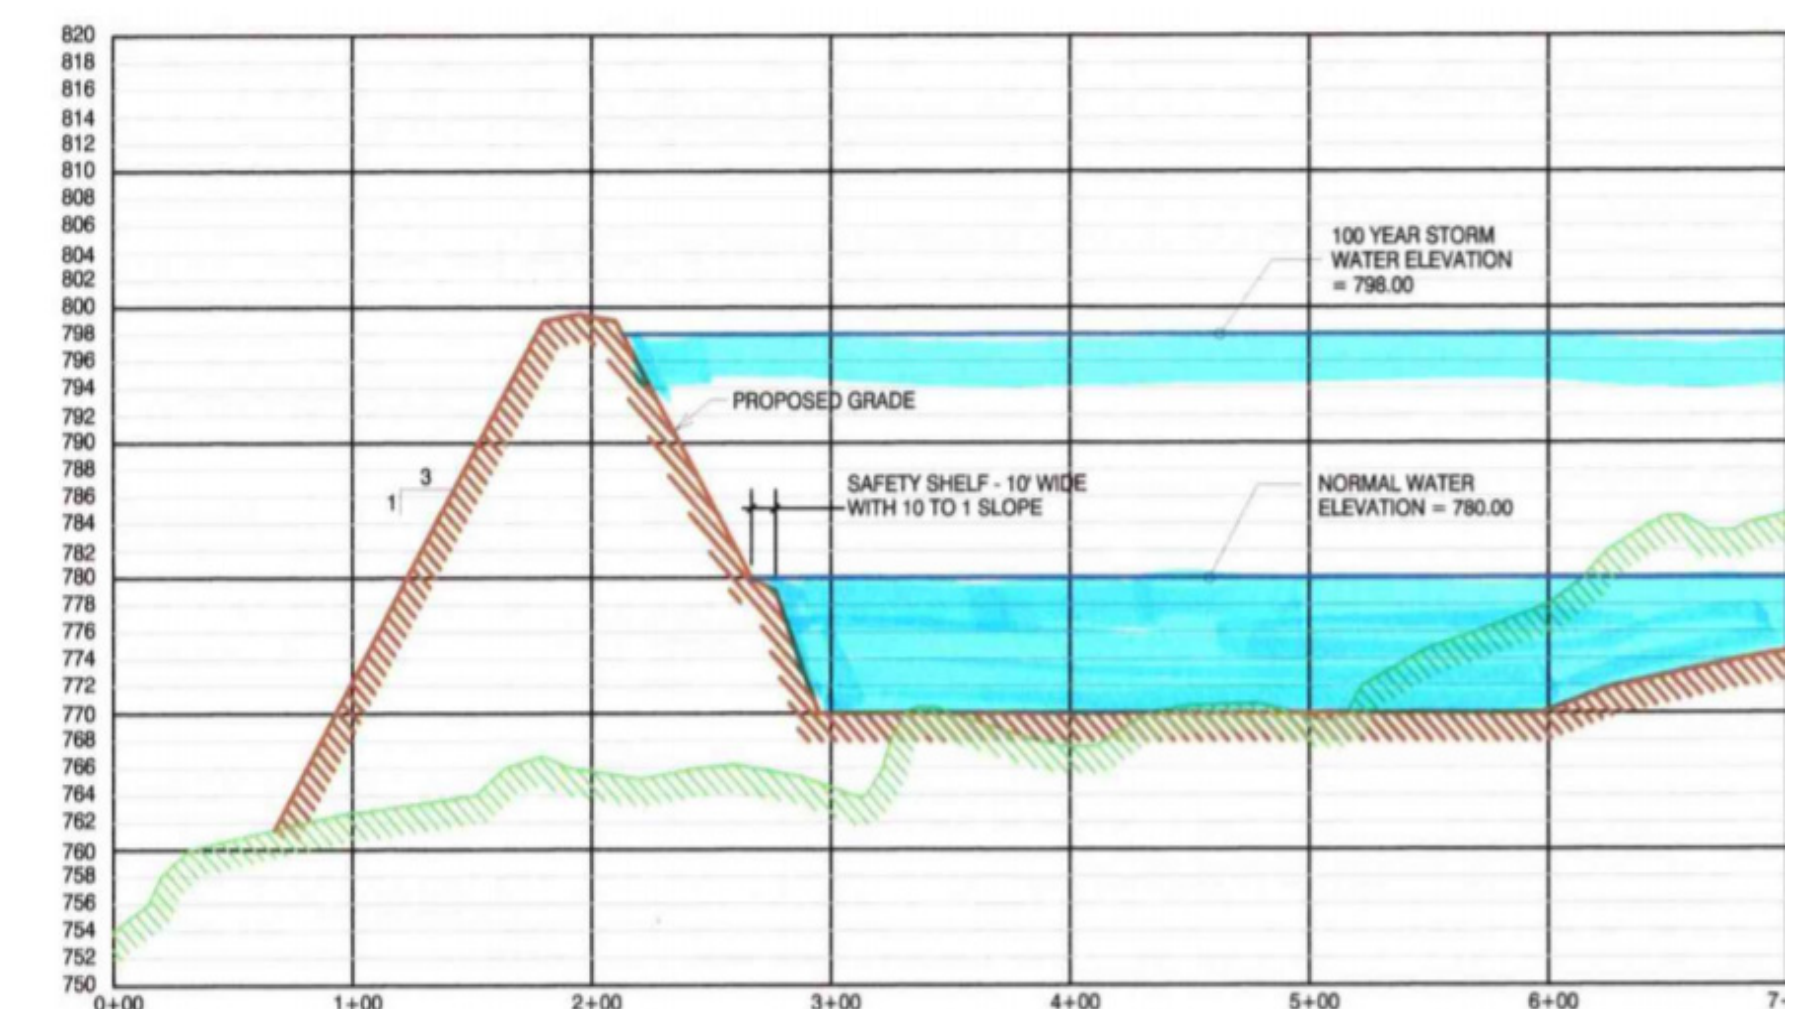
Central Pond Location cross section facing west (vertically exaggerated)
